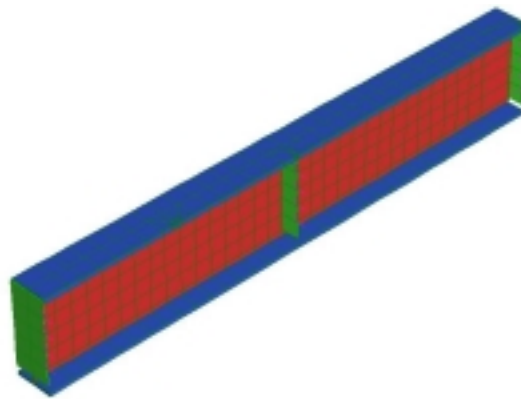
Preliminary web-stiffener plate element sub-model.
